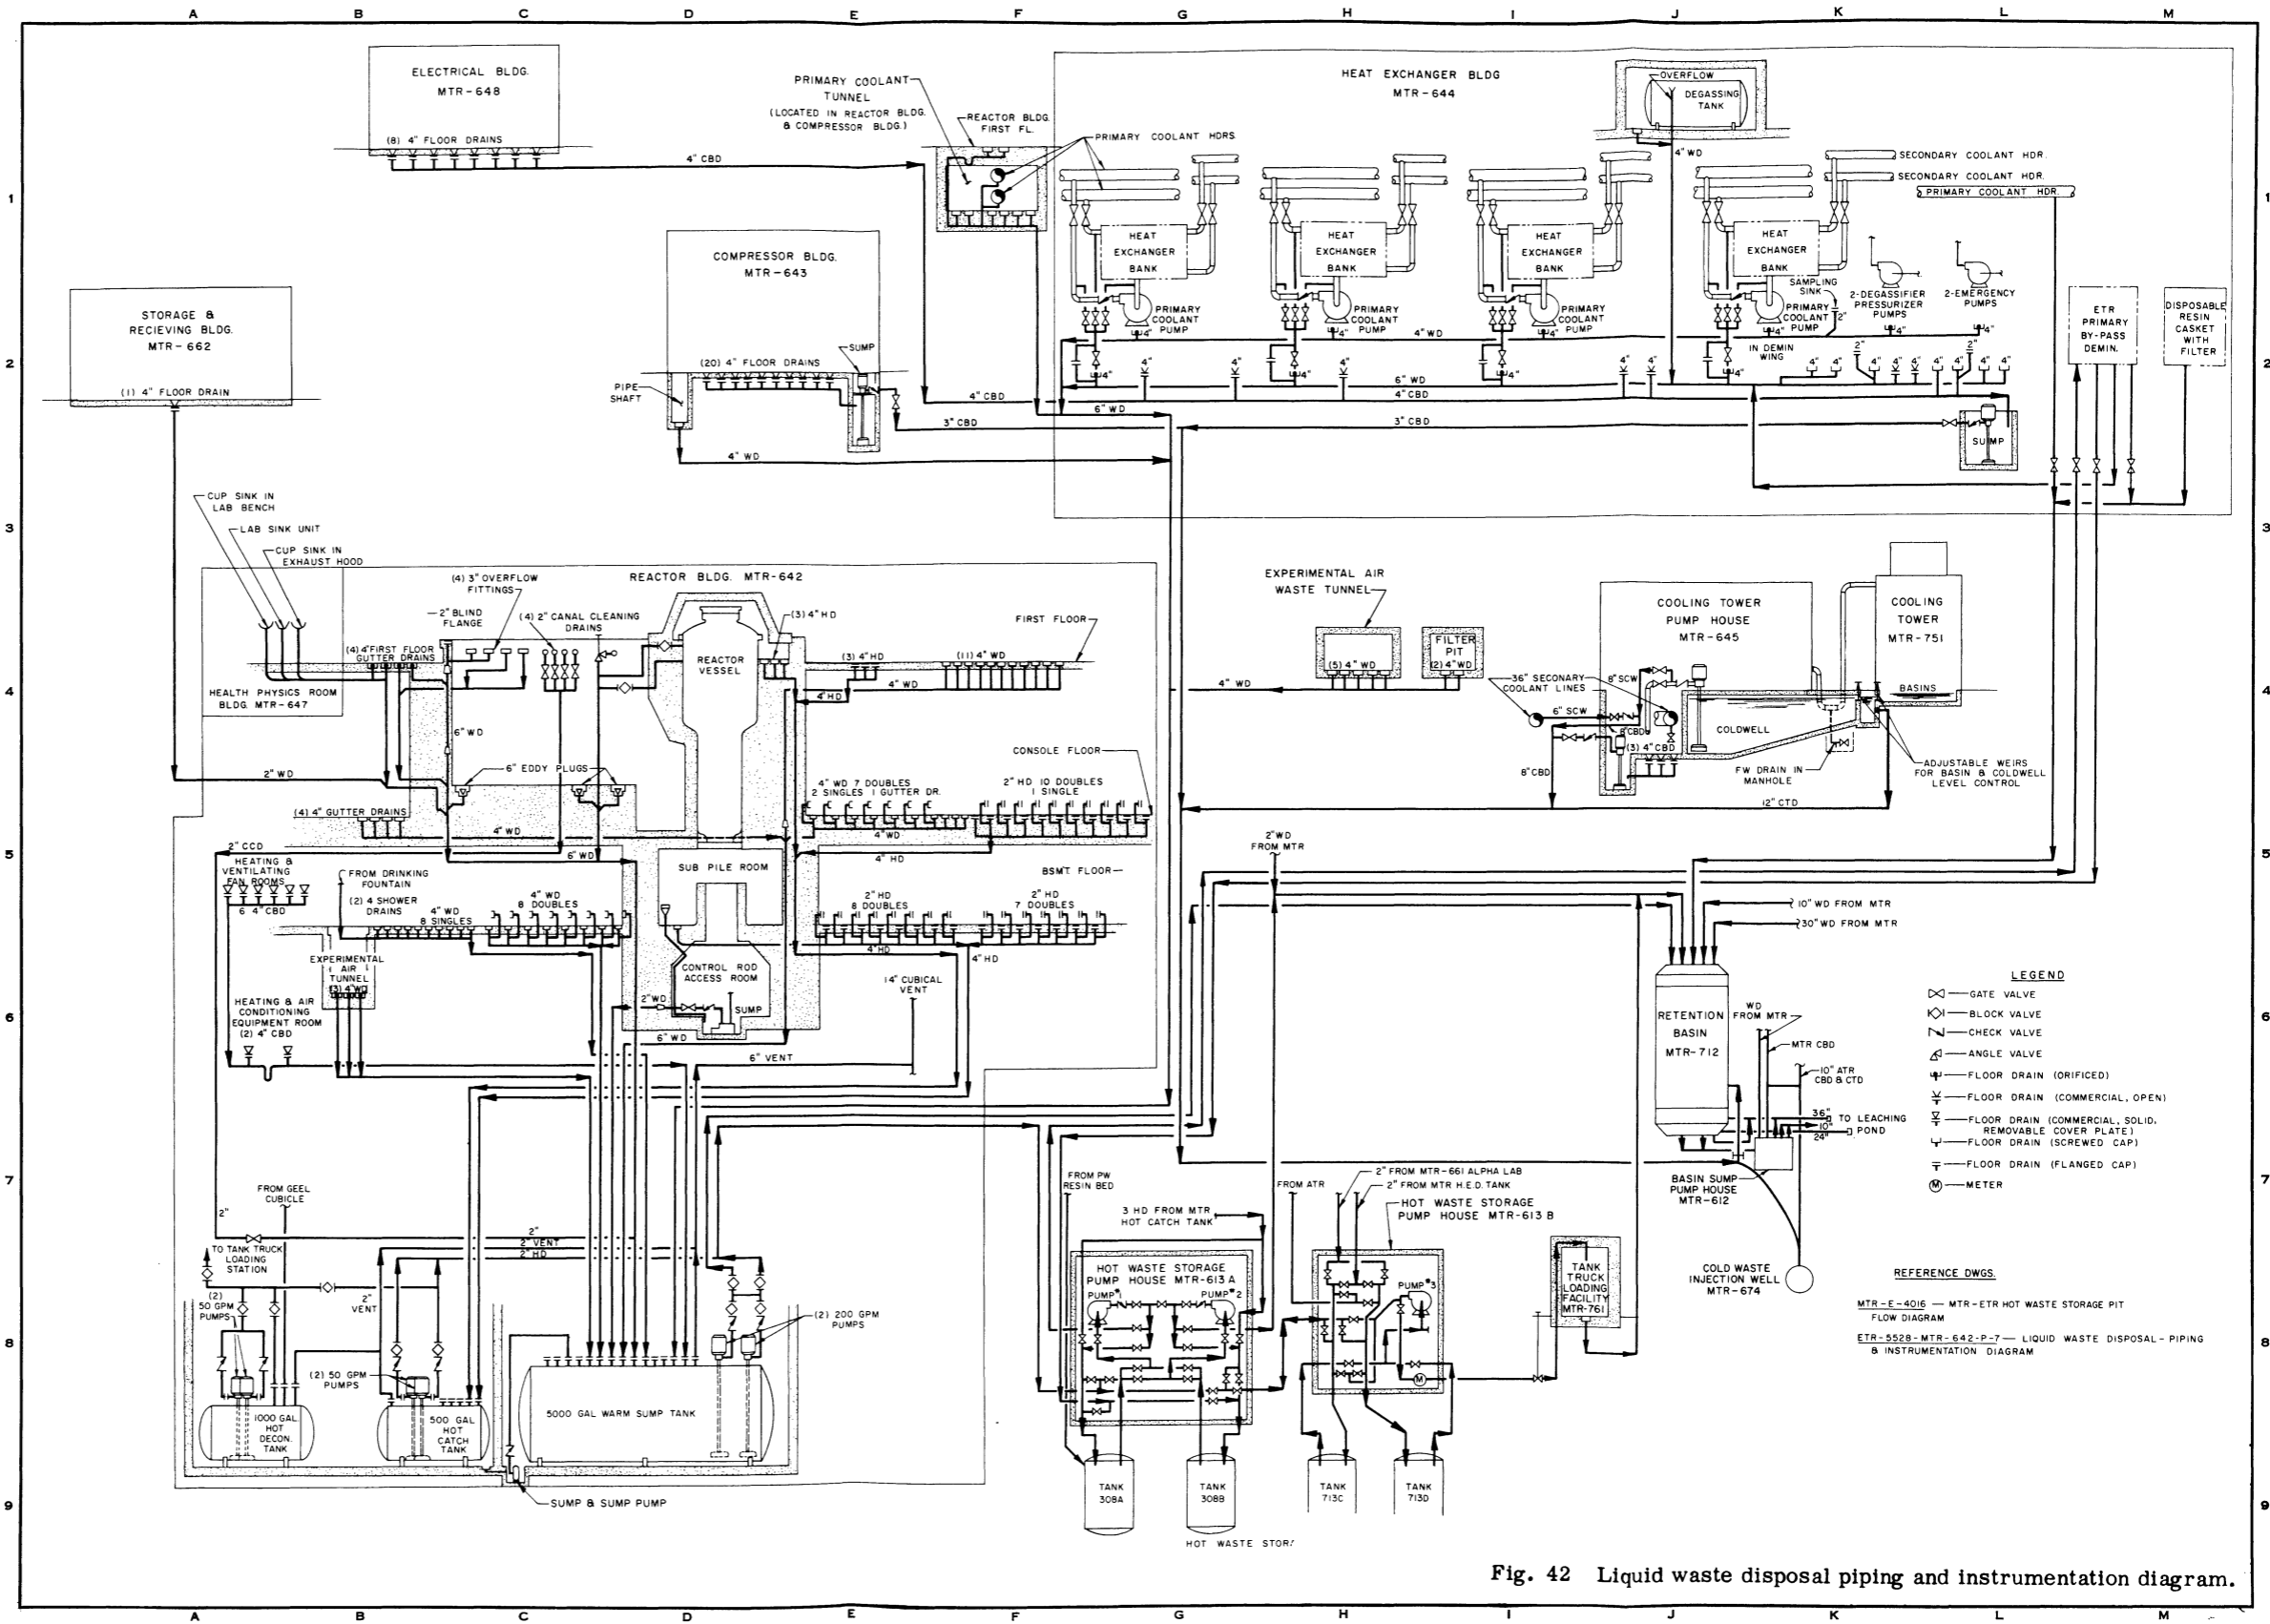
Liquid waste disposal piping and instrumentation diagram.
